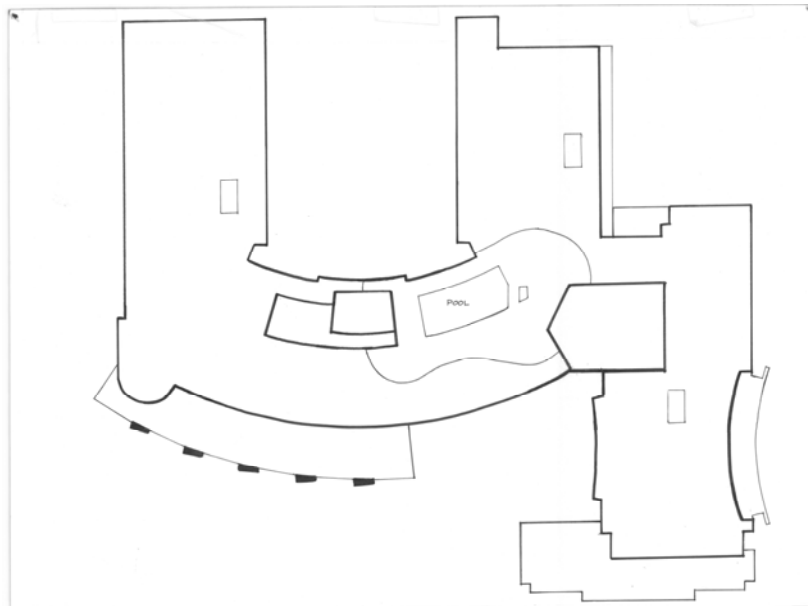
Penthouse Roof Plan showing overall shape of the upper floors and location of penthouse amenities.
